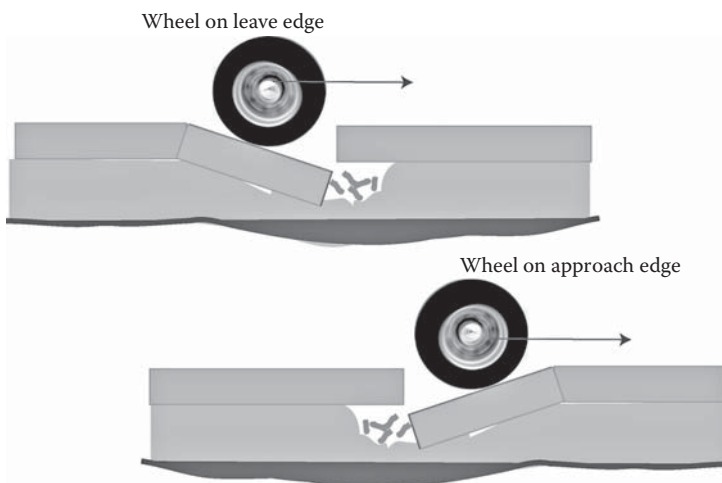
Faulting in jointed plain concrete pavements without dowels.
